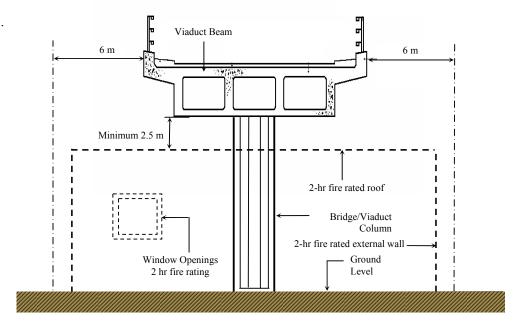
Clearance of building roof below bridge/viaduct (Cross Section)
